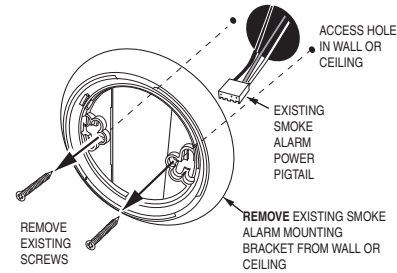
Remove Existing Smoke Alarm Mounting Bracket from Wall or Ceiling
